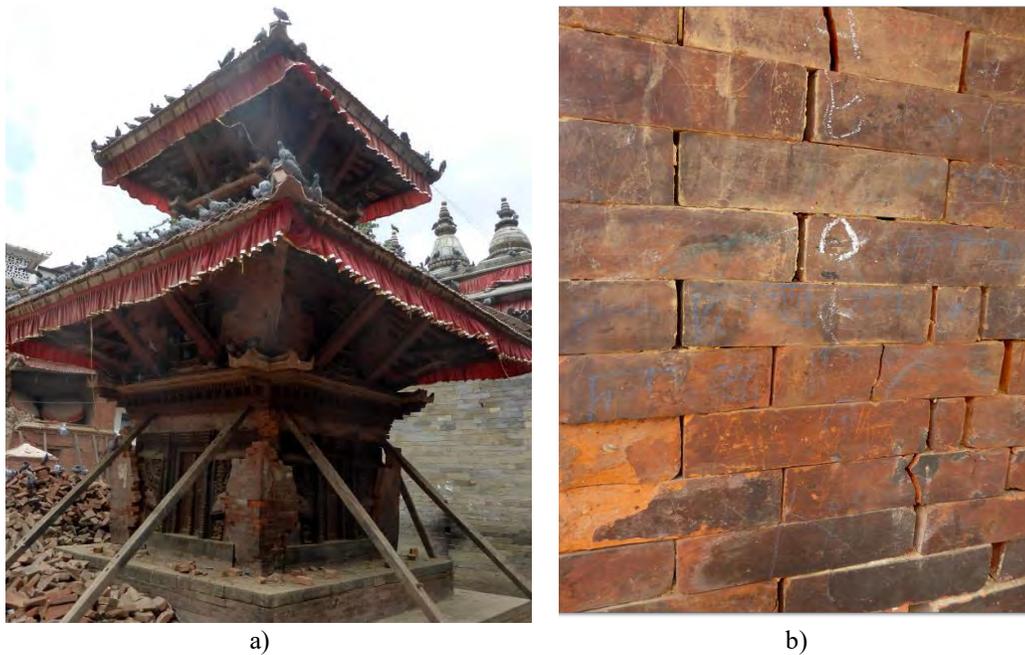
Damage to a two-tiered temple at Kathmandu Durbar Square: a) a view of the temple after the earthquake and b) an exterior brick masonry wall (S. Brzev)
